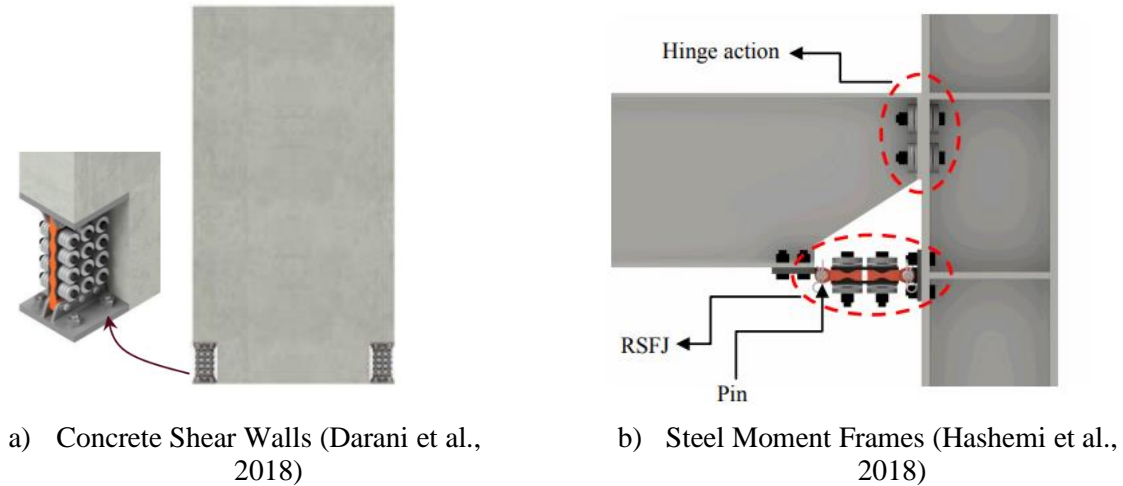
Examples of RSFJ Applications in Concrete and Steel SFRSs
